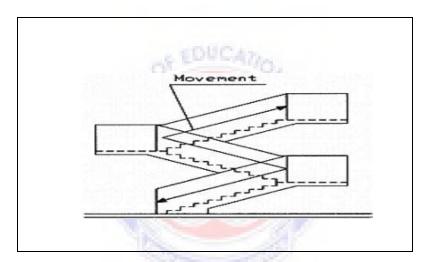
Switch-back stairs fitted with platform lifts (Source: SOLIDERE, 2004)
